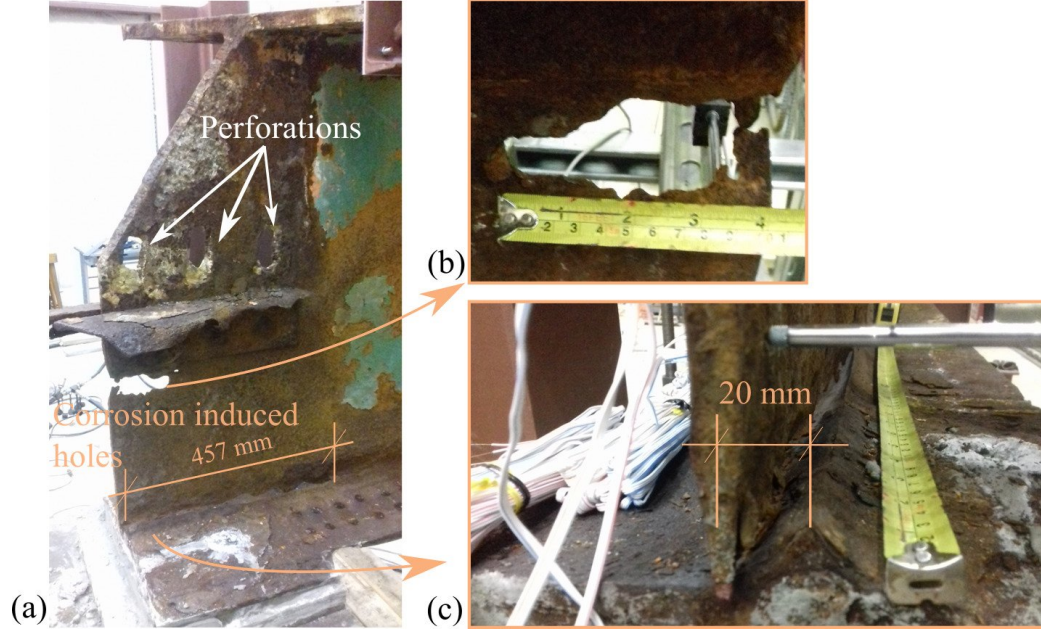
(a) Specimen 3 is a 84 cm deep girder obtained from Bridge A, with two corrosion-induced holes. (b) Hole located mid-height. (c) The hole located directly above bottom flange extends 15.2 cm beyond the bearing.
